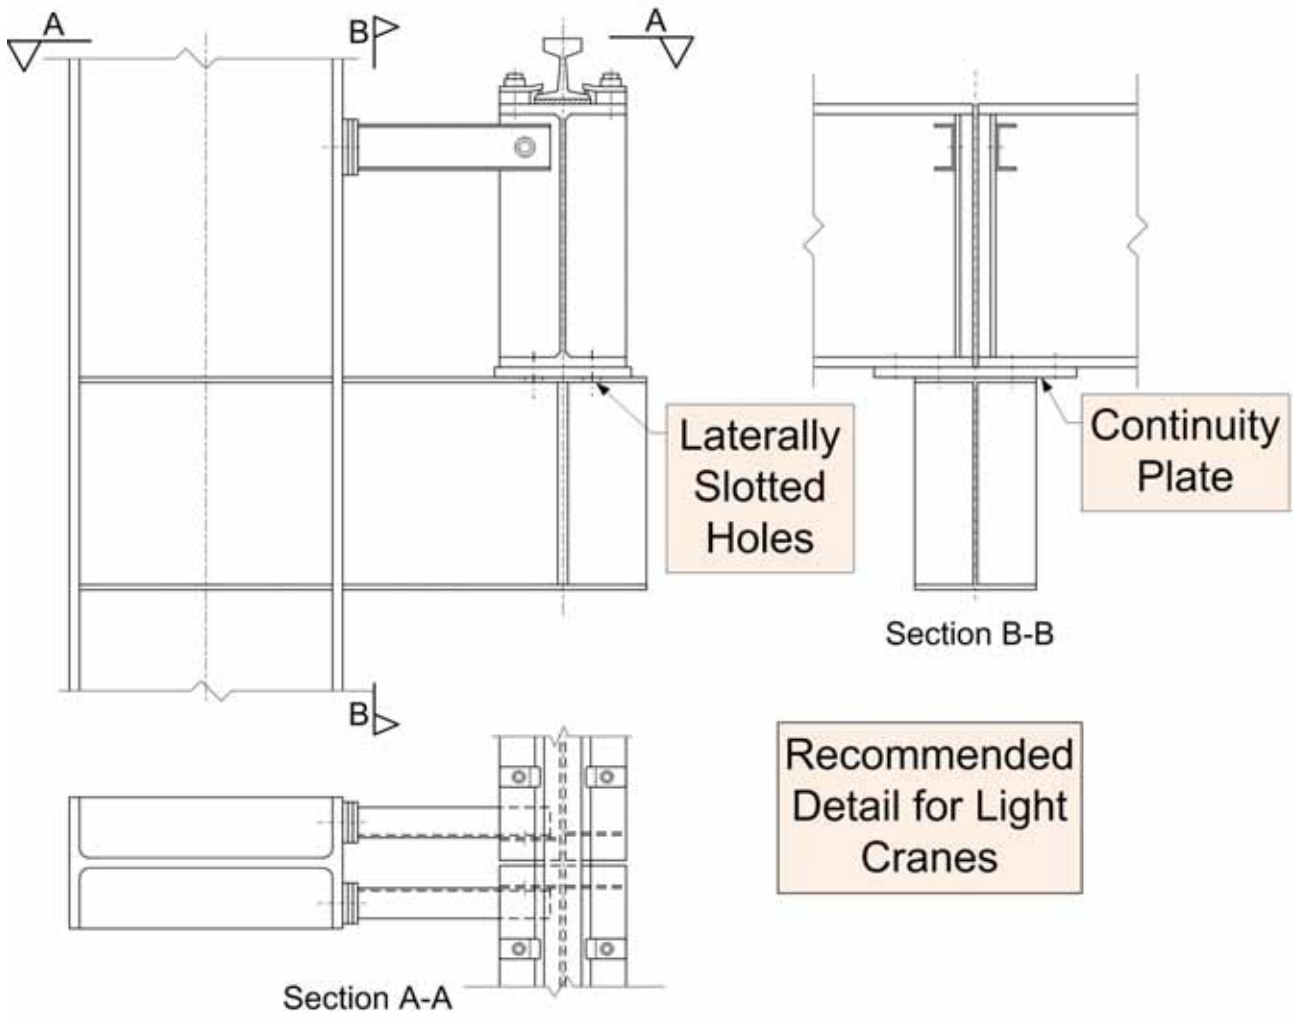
Recommended detail for light cranes that sit on a bracket.
